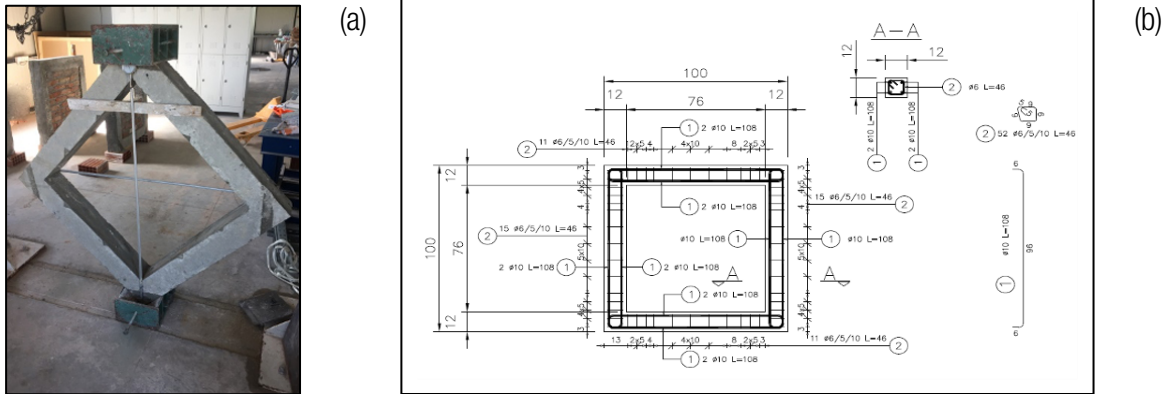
(a) RC frame ready for testing; (b) CAD drawing of the reinforcement detailing of the frame.
